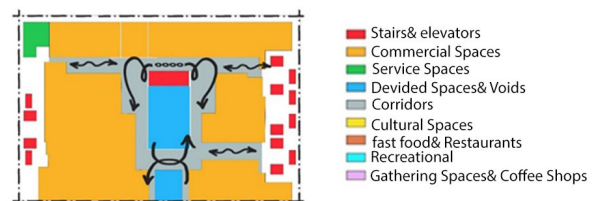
Schematic plan of the first floor of Tiraje2. Source: Authors.
